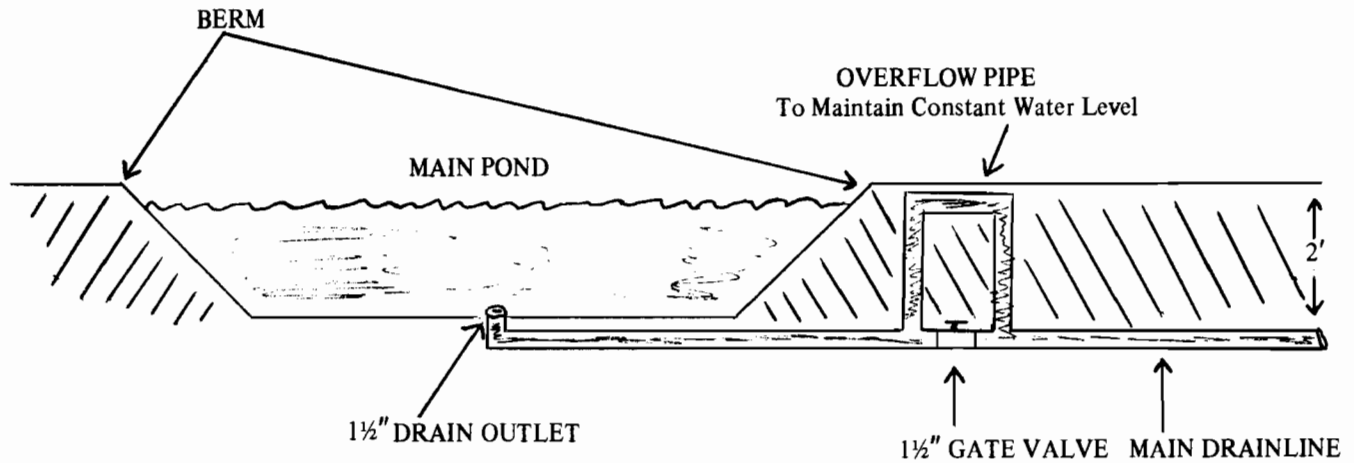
Cross section of deep end of pond showing drain and overflow pipe arrangement.
